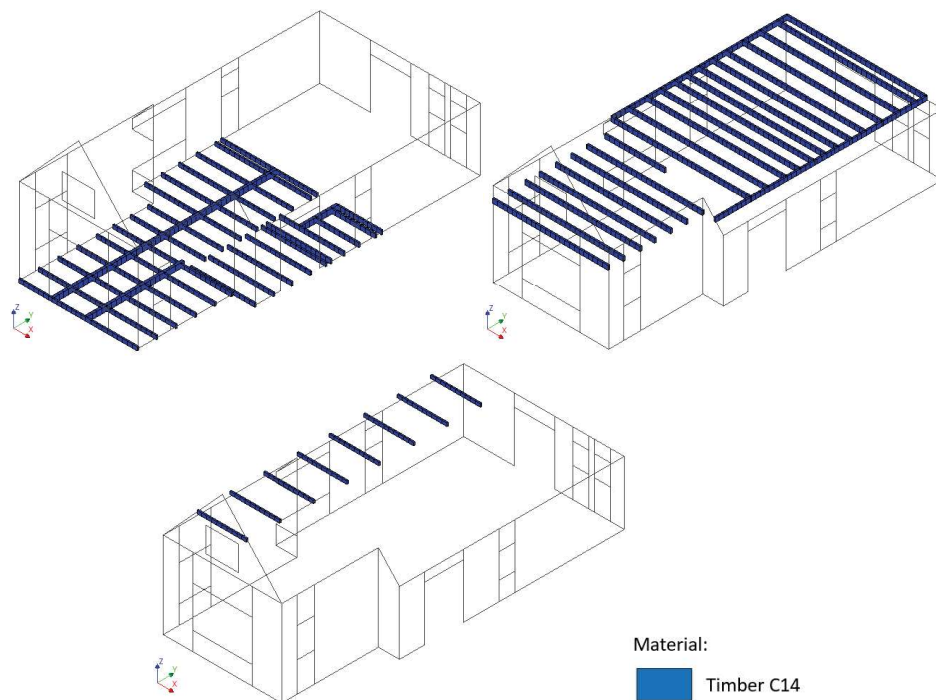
Floor timber beams. Ground floor (top left), first floor (top right) and attic floor (bottom)..
